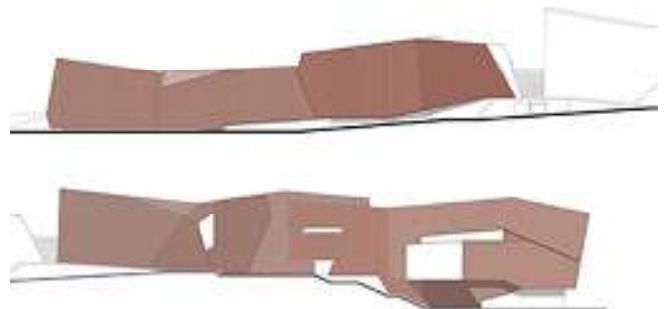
Plans, sections, perspectives and elevations of Freedom Park (Archdaily, 2012: online).
